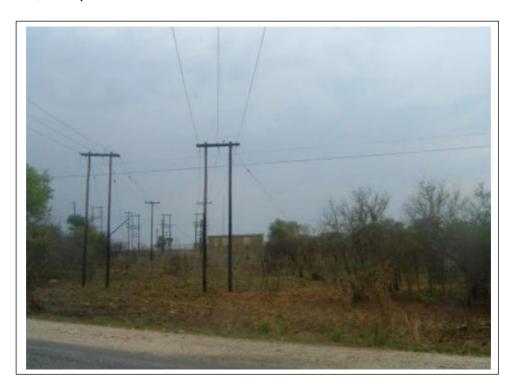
The Lemara Substation on Richmond 604KT where the proposed new 132kV Lemara-Leboeng power line commences (above).
